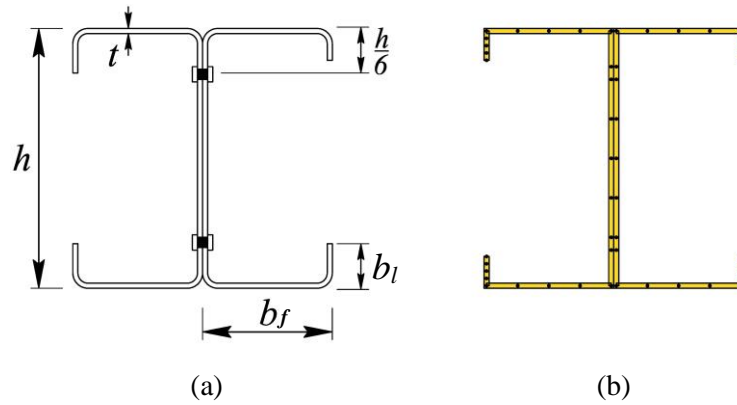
A typical built-up I-section: (a) geometry, (b) simplified finite strip discretization
